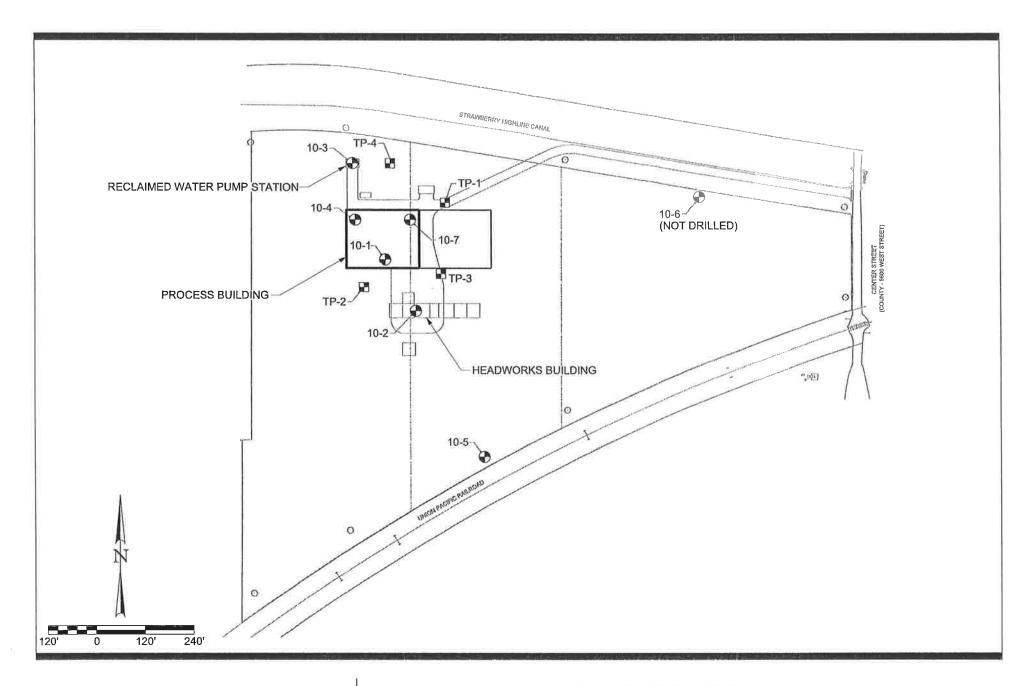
SITE PLAN & TEST HOLE LOCATIONS
